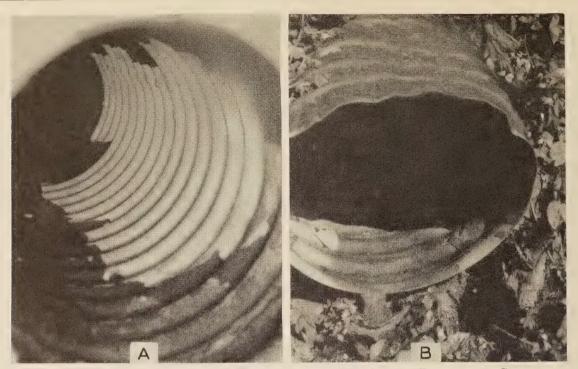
A, ASPHALT COATING STRIPPED FROM WALL BY WATER SURGING THROUGH THE CULVERT ON 47 PERCENT GRADE; B, LOSS OF PAVEMENT FROM SAME CULVERT WITH RUSTING OF EXPOSED METAL.
